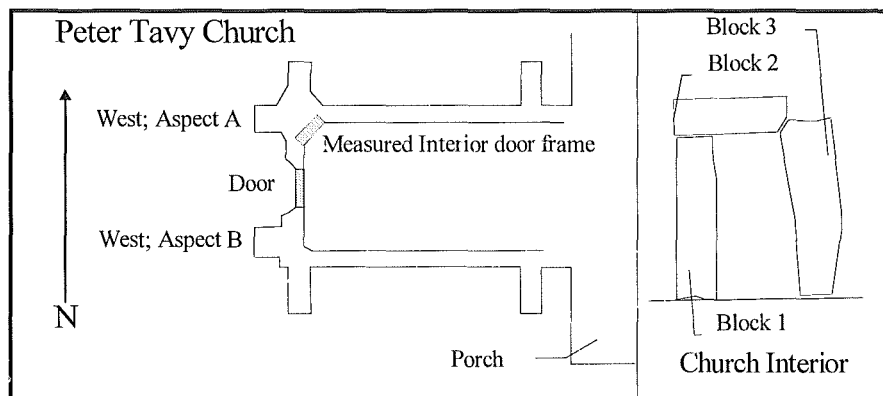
Site plan of Peter Tavy church and interior doorway.
